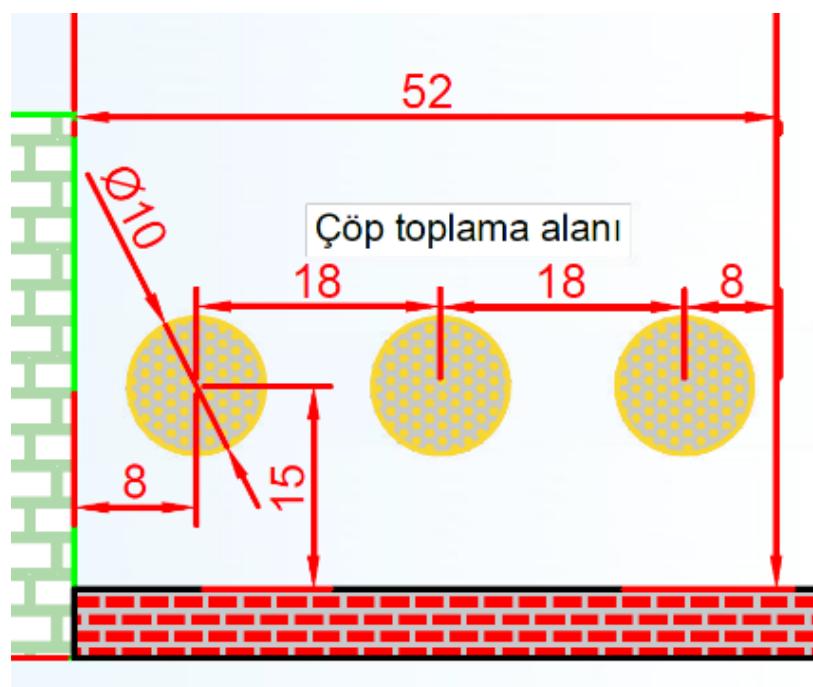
Technical Dimensions of the Platform's Top View (centimetres)
